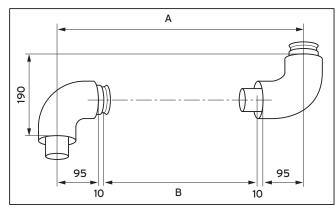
Installation of 87° elbows, Accy. No.: 303 910
